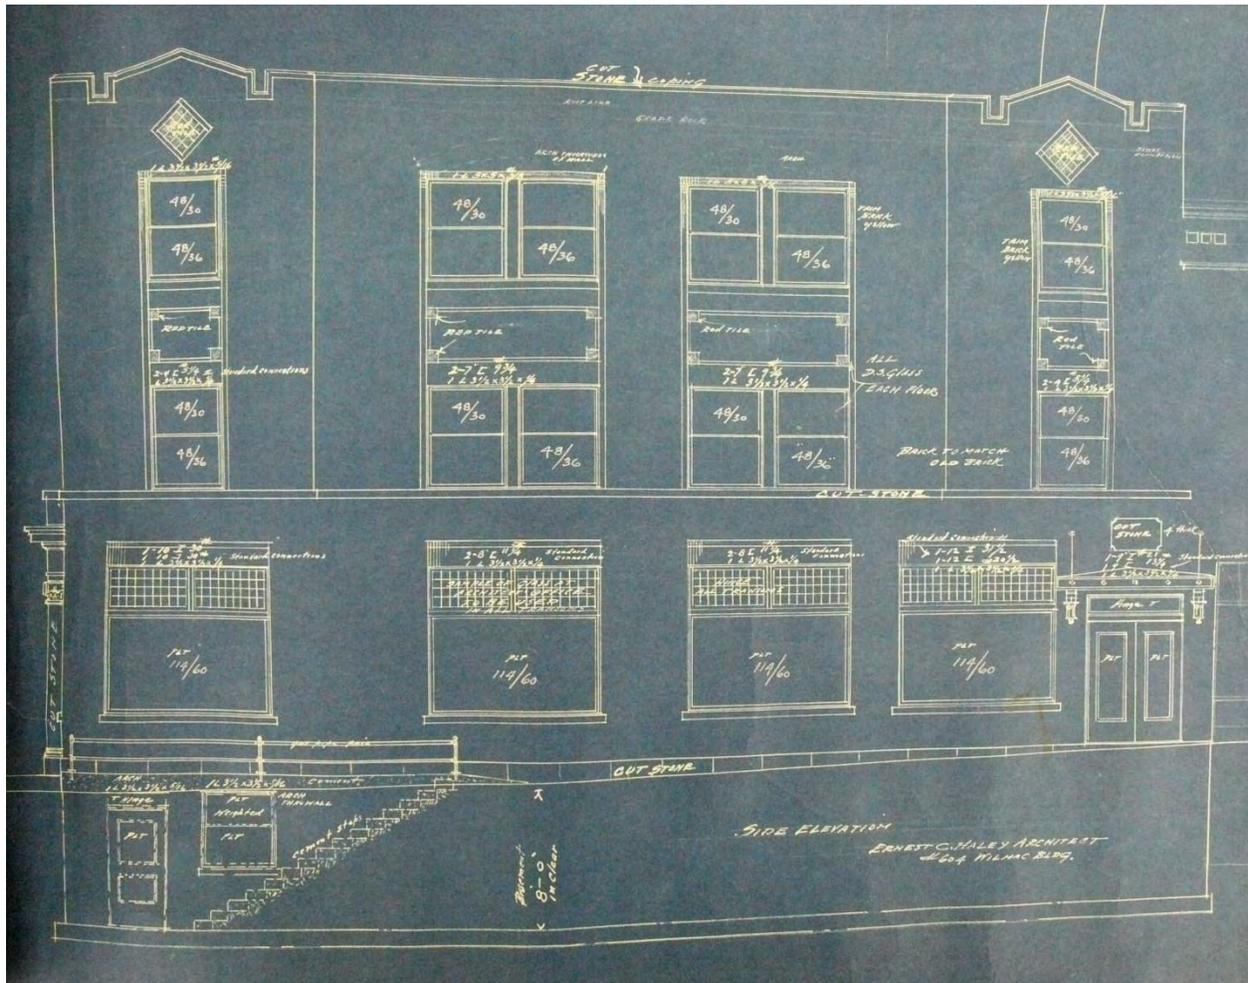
42nd Avenue North elevation, source: Northwest Architectural Archives
